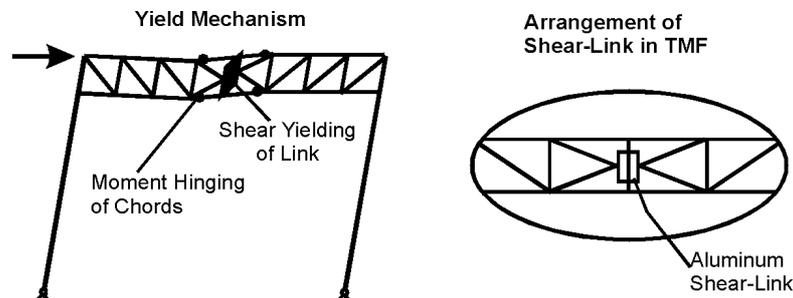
Schematic diagram and typical collapse mechanism of the SLTMF system
